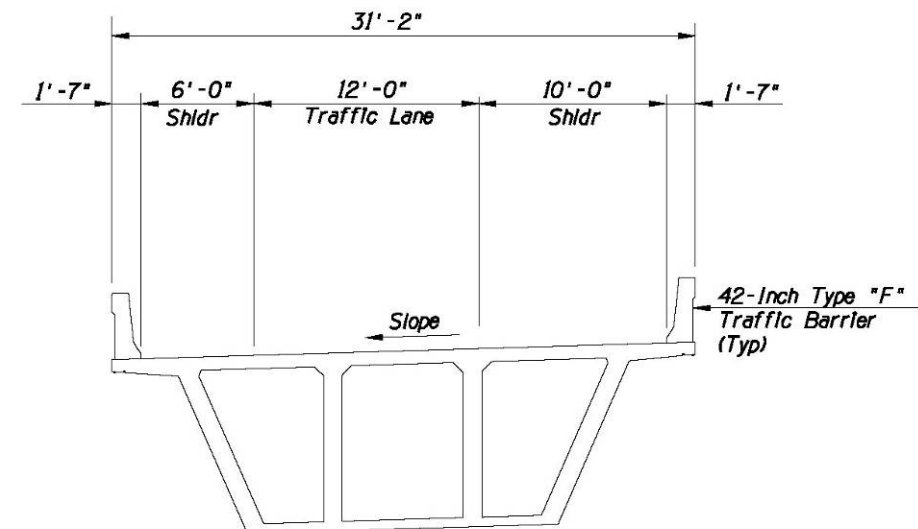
Frontage Road Bridges Over Ramps WN and SW
